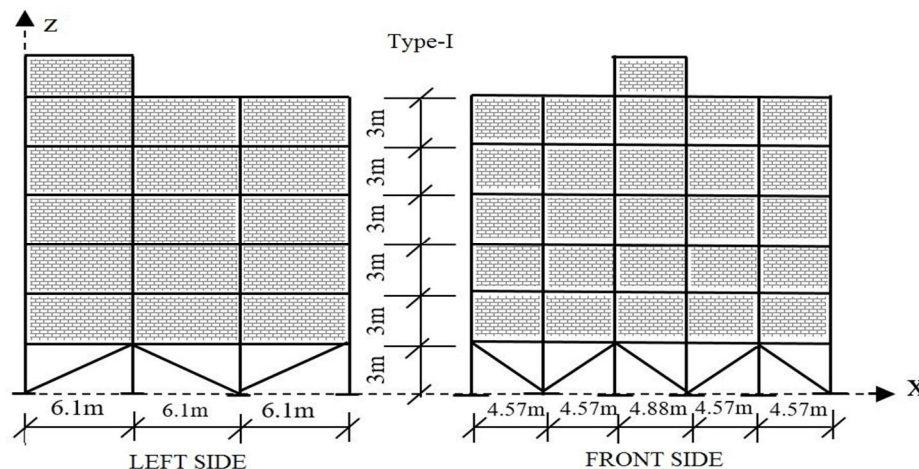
Elevation of first soft story in six storied building with bracing Type-I (single diagonal)
